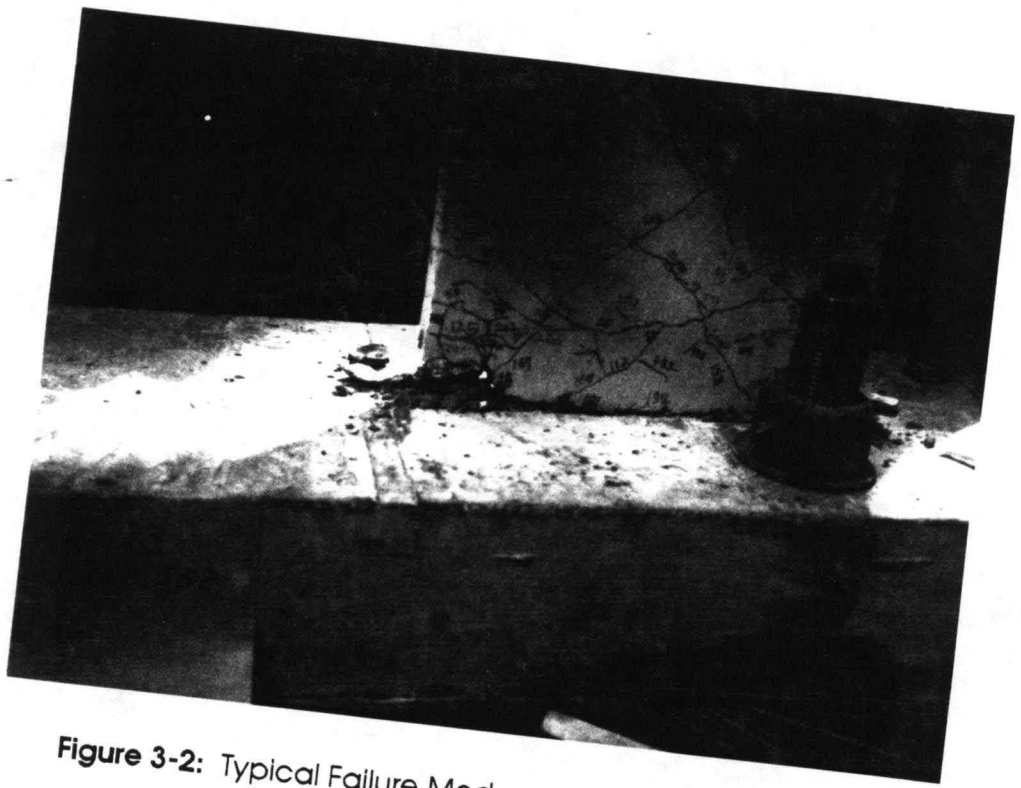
Typical Failure Mode at Bottoms of Shear Wall
